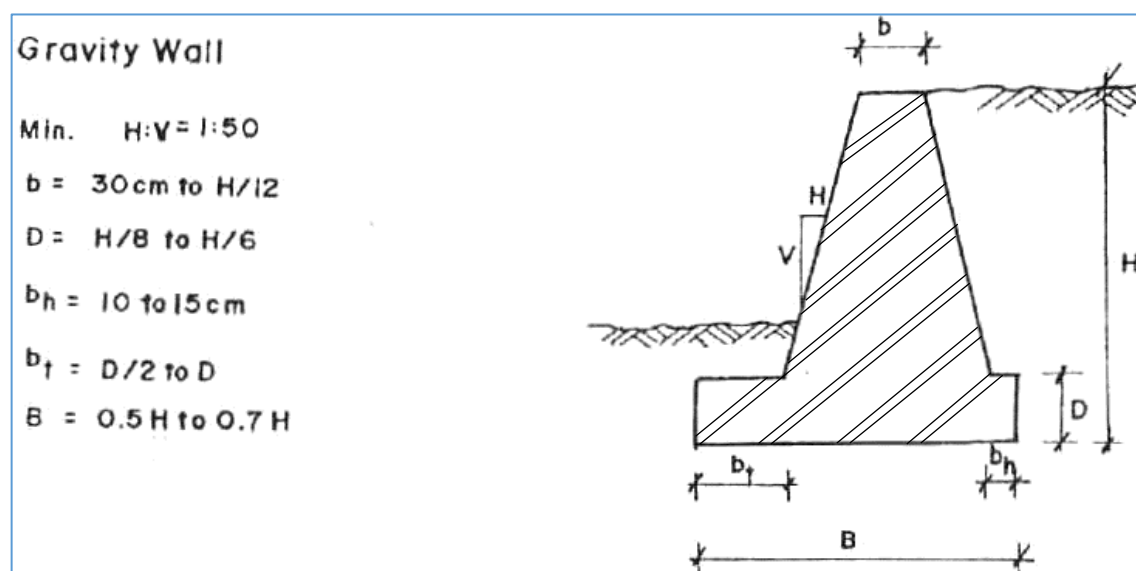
Typical gravity masonry retaining wall (Halcrow-ULG, 1988)
